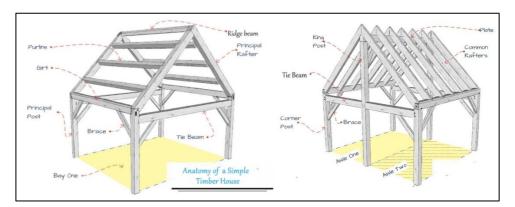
Anatomy of a simple timber house (http://www.timberframediy.com).
